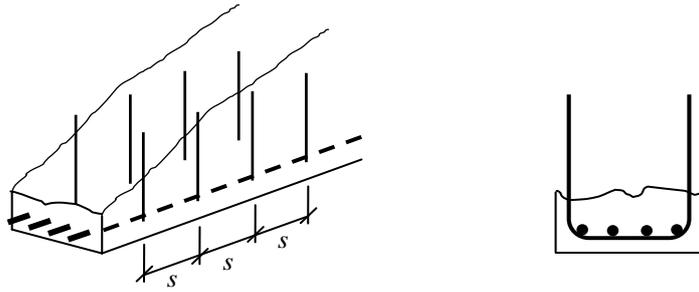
Legs that cross the shear crack in a beam in case of single stirrups. Figure is based on Engström (2010).
